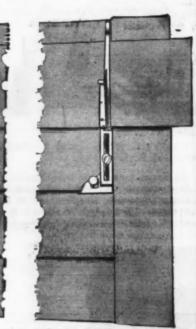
Improved Clapboard Holder, Siding Gauge and Scribe Hook
